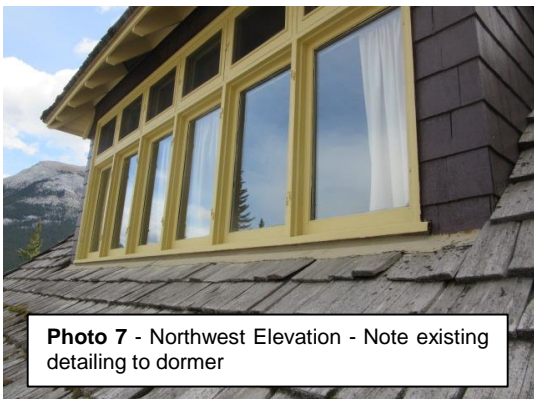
Northwest Elevation - Note existing detailing to dormer
